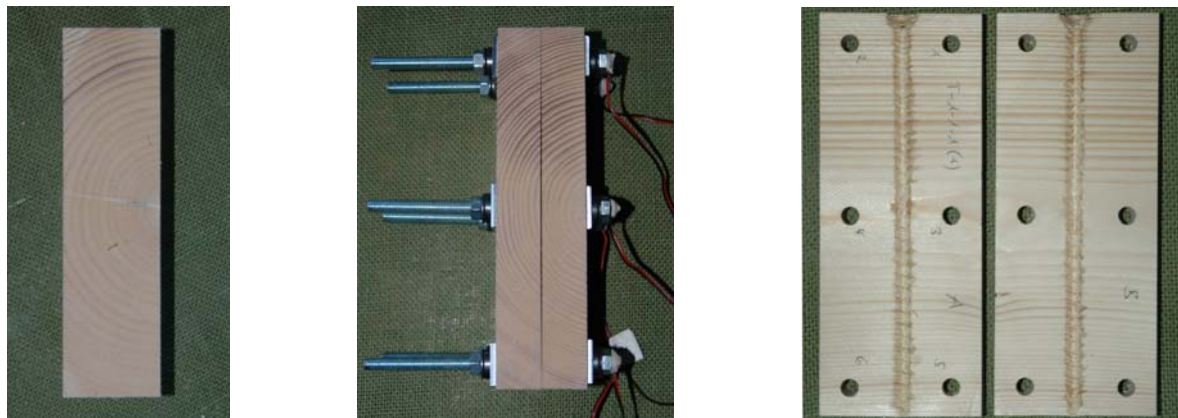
Two-part test specimen connected with measurement bolts (middle) made of one cross section (left), opened specimen after the test (right)
